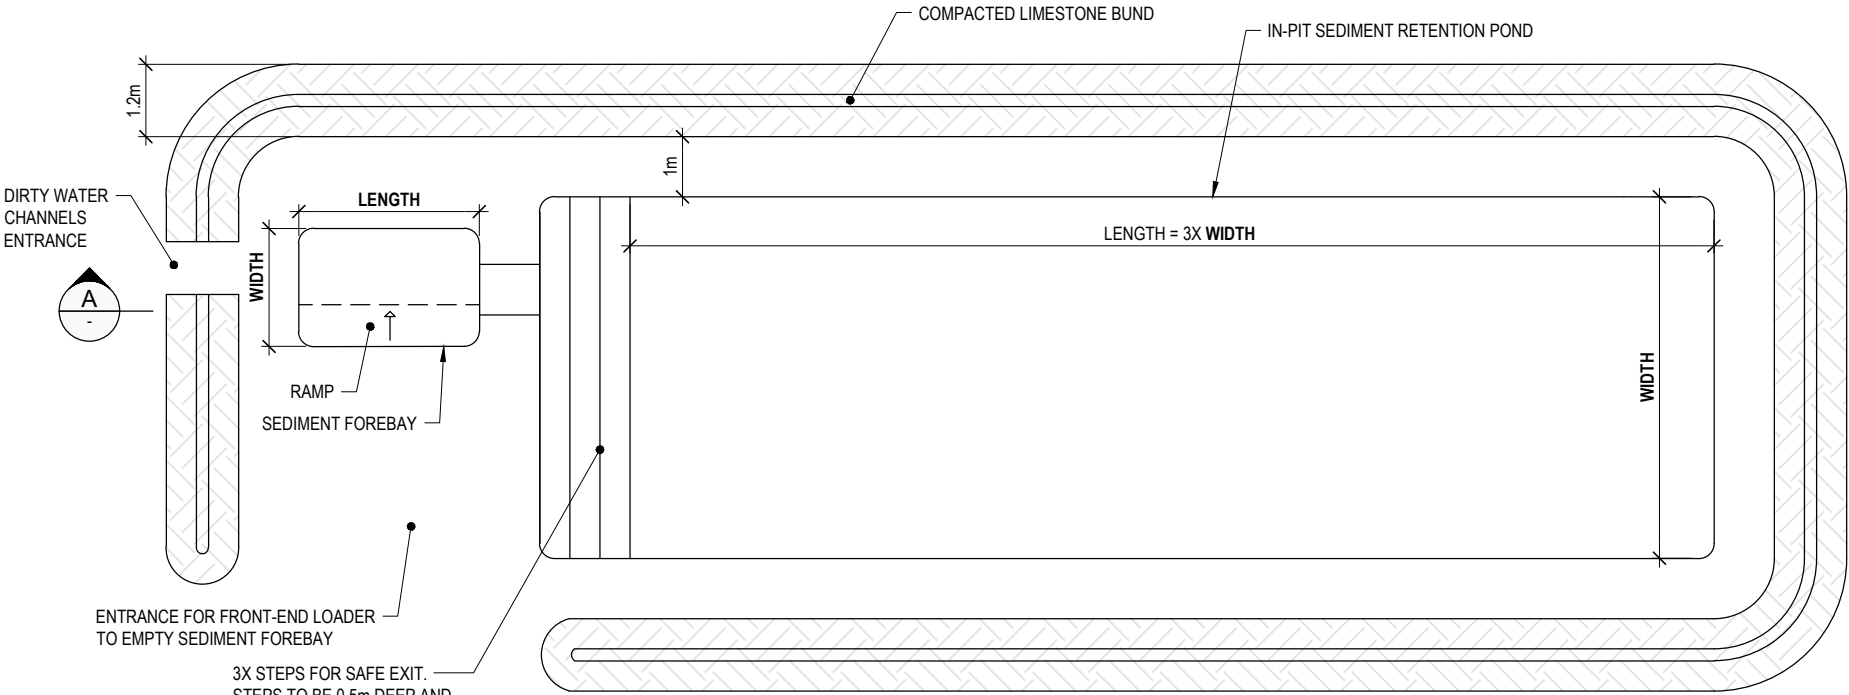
IN-PIT SEDIMENT INFILTRATION POND PLAN
